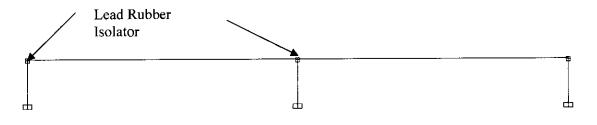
Elevation of Isolated Bridge (Straight Bridge)
